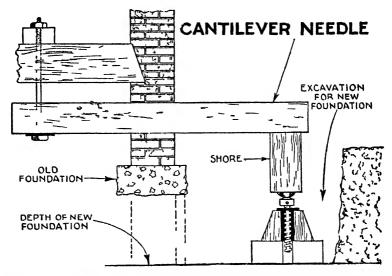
611—Cantilever needle method of under pinning old building for the erection of new foundation or pier reinforcement to old foundation
